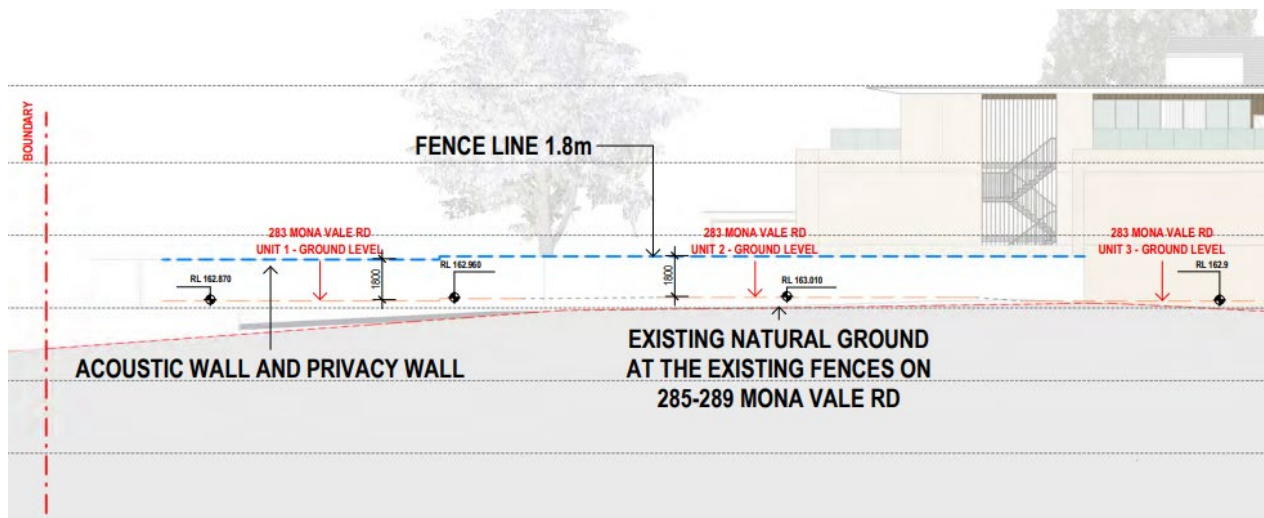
| Section plan showing location of acoustic wall on the boundary interface with 283 Mona Vale Road
